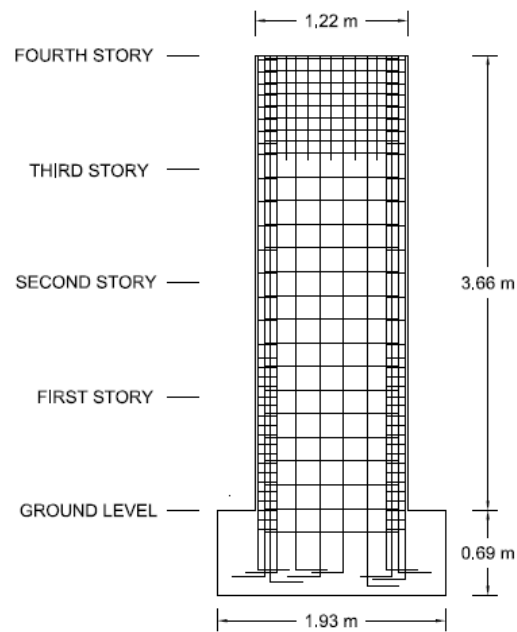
Profile view of specimen RW2 showing placement of reinforcement (Thomsen and Wallace, 1995).
